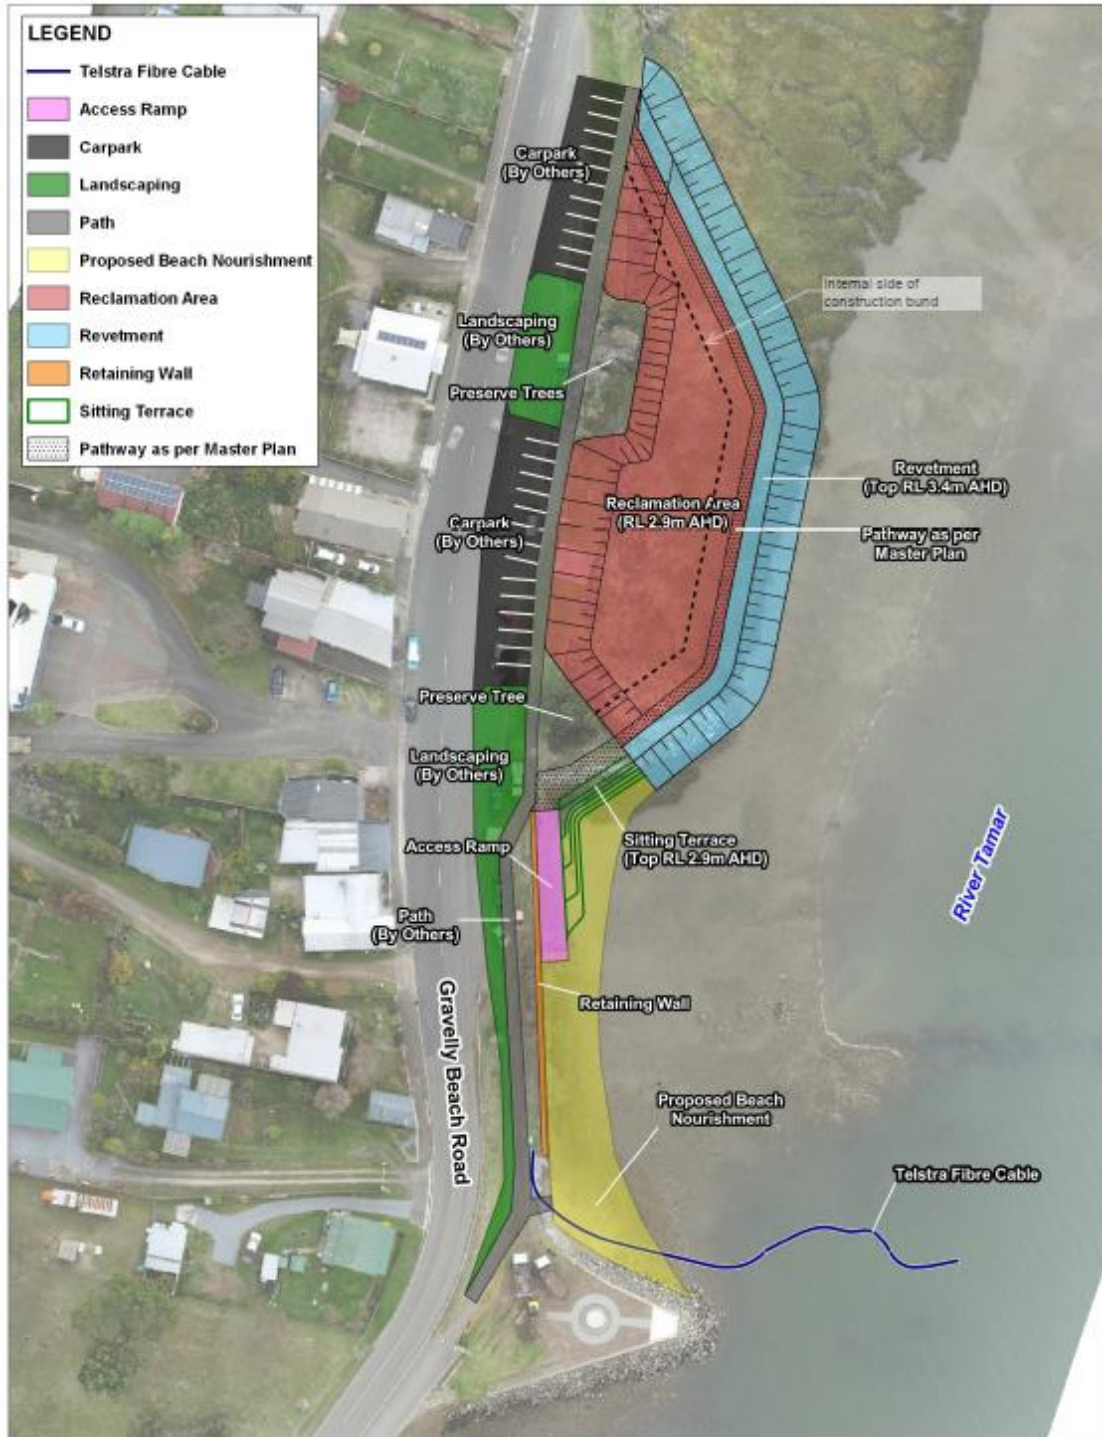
Proposed location of the shoreline works at Gravelly Beach.
